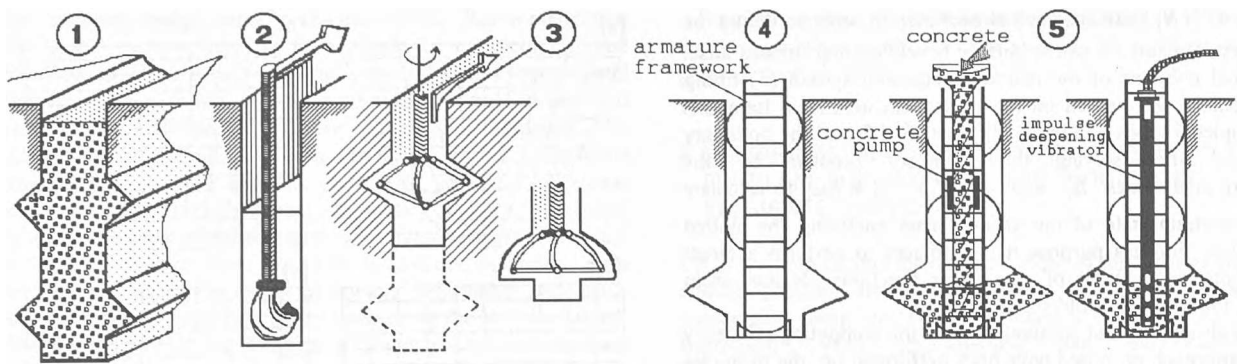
Diagram of technological process of arrangement of slotted foundation with supporting broadenings: (1) ready-made slotted foundation with supporting broadenings; (2) digging a trench; (3) arrangement of supporting broadening; (4) reinforcing by volume frameworks; (5) concreting the foundation
